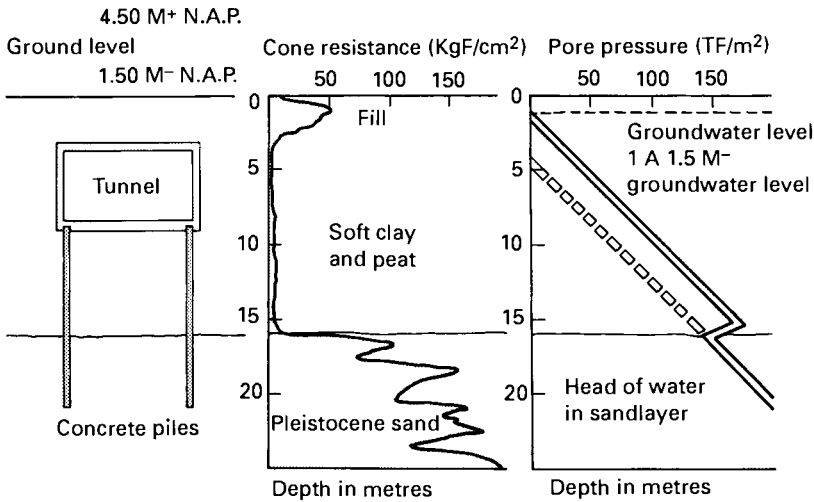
Subsoil in Rotterdam; tunneling principle, cone resistance and water pressure
